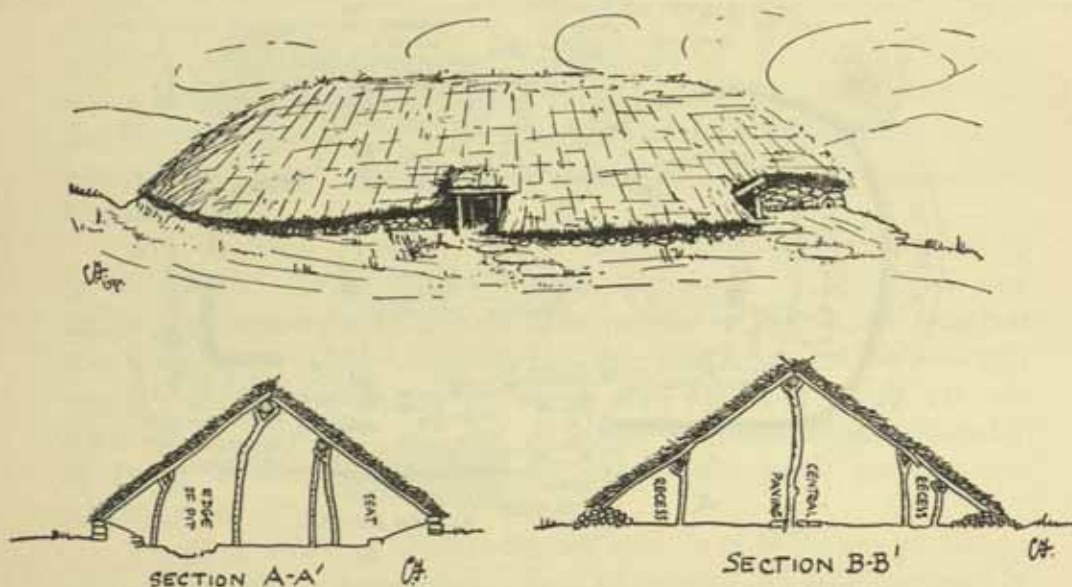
Reconstruction (elevation and cross-sections) of aisled house at Dinas Noddfa, Gelligaer, Glamorgan
